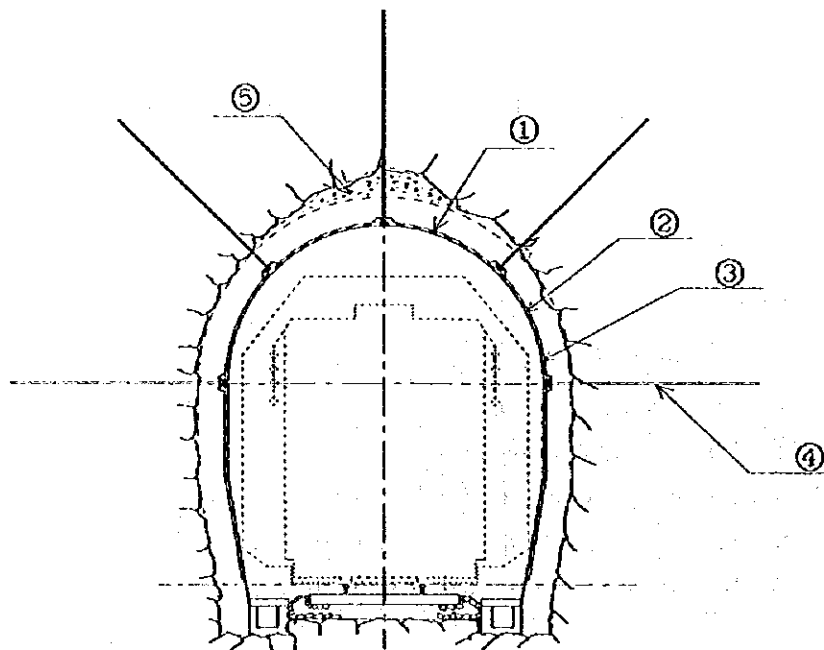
Type 2 Tunnel Improvement Work
